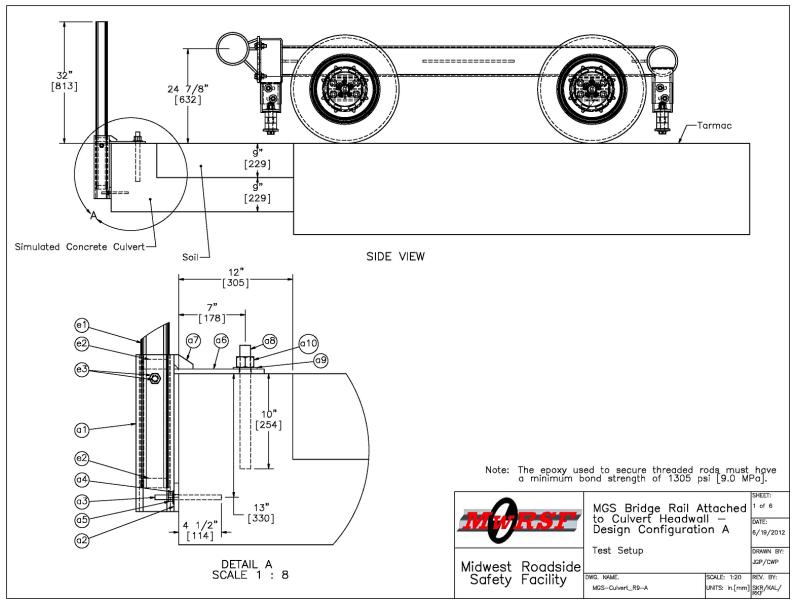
Design Concept A: Top-Mounted, Single-Anchor Attachment
